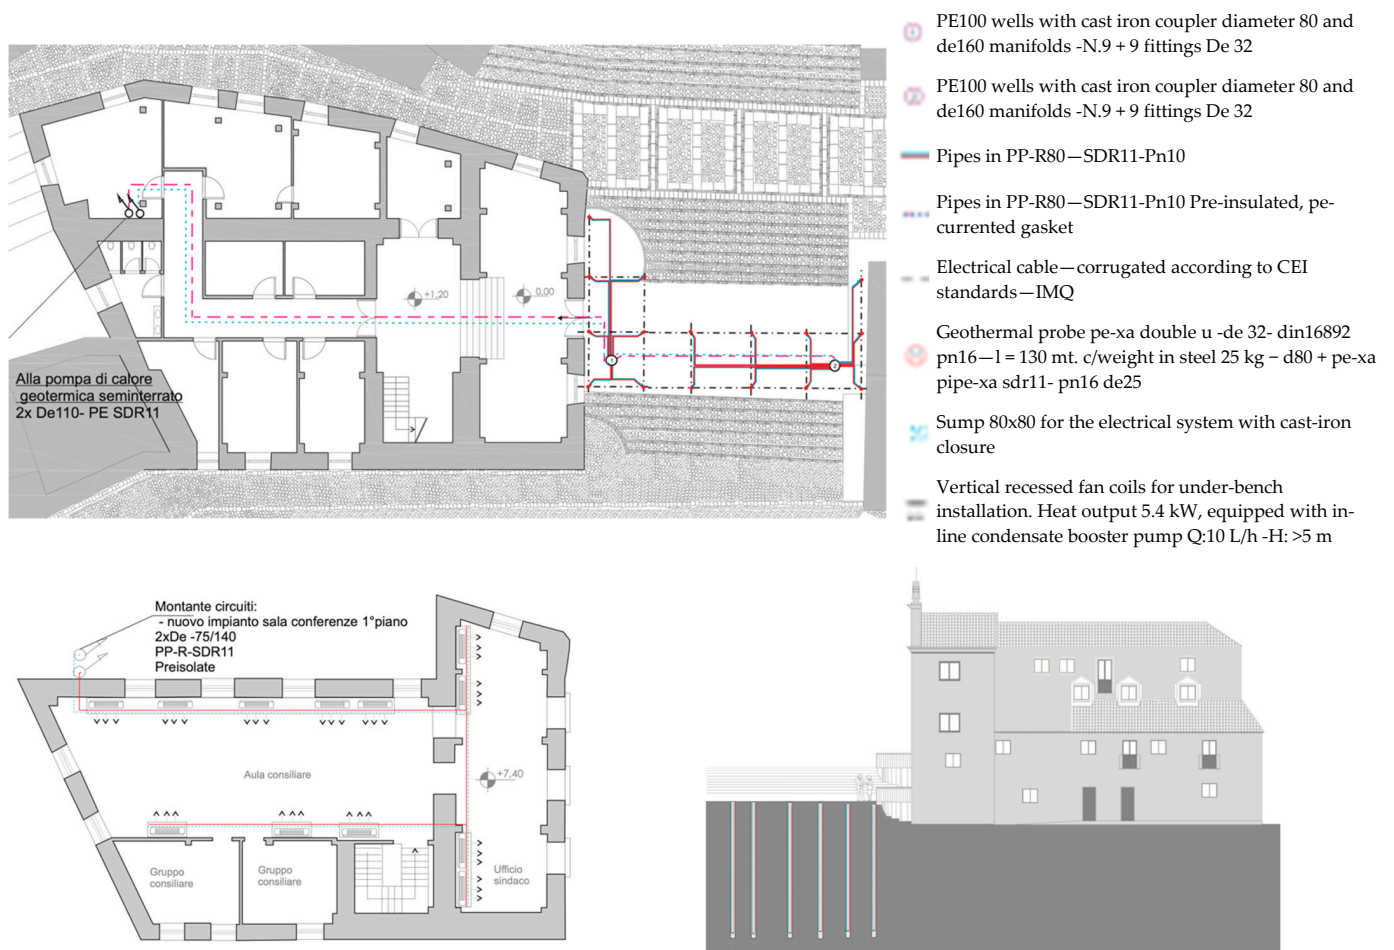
Example of the installation of a geothermal system in a historic building, the Municipal Palace of San Mauro Castelverde. Ground floor plan, first floor plan, and elevation. Images made by: Arch. Maria Rosaria Cimilluca.
